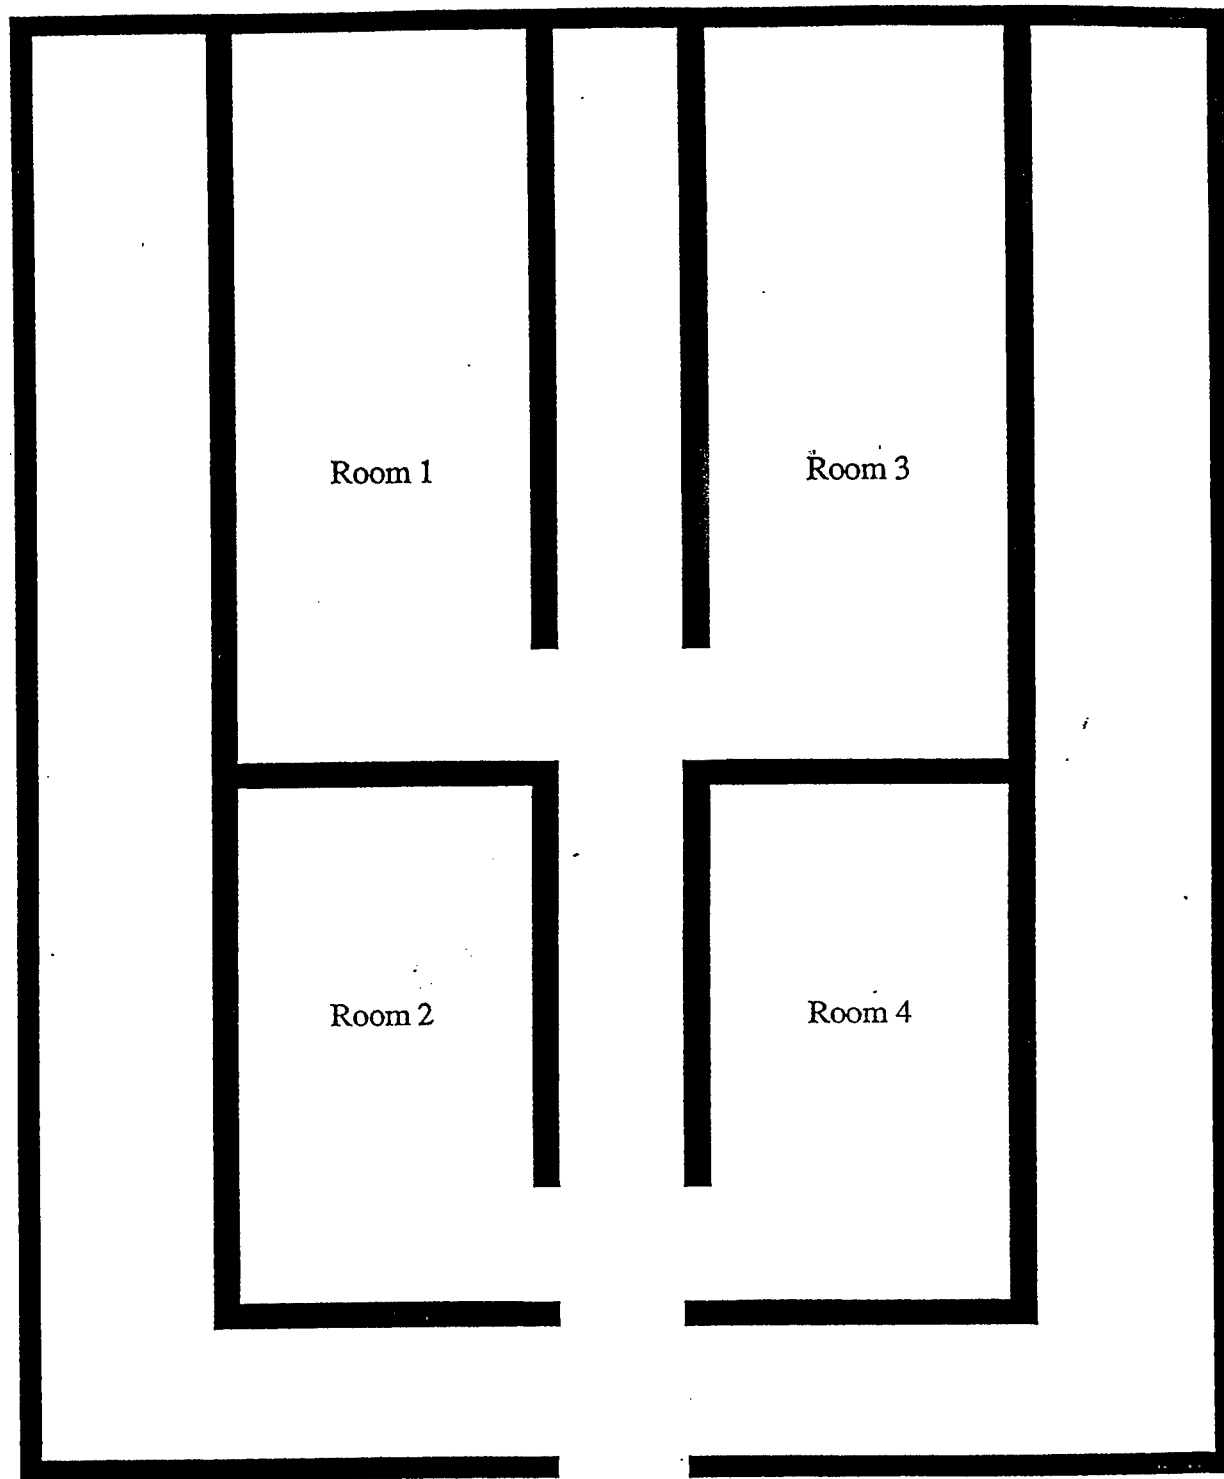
Floor plan for DIPOLE ORBIT 3 and 6 structures.
